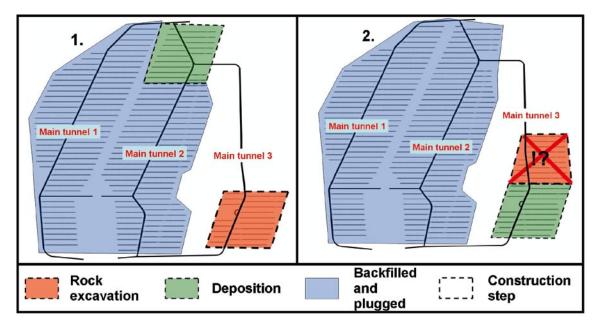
As the first construction step in main tunnel 3 is excavated and deposition is started, there is nowhere to go for excavation.
